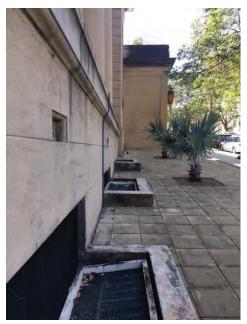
Light wells on the southern façade of the building (Source: NBRSARCHITECTURE 2018)
